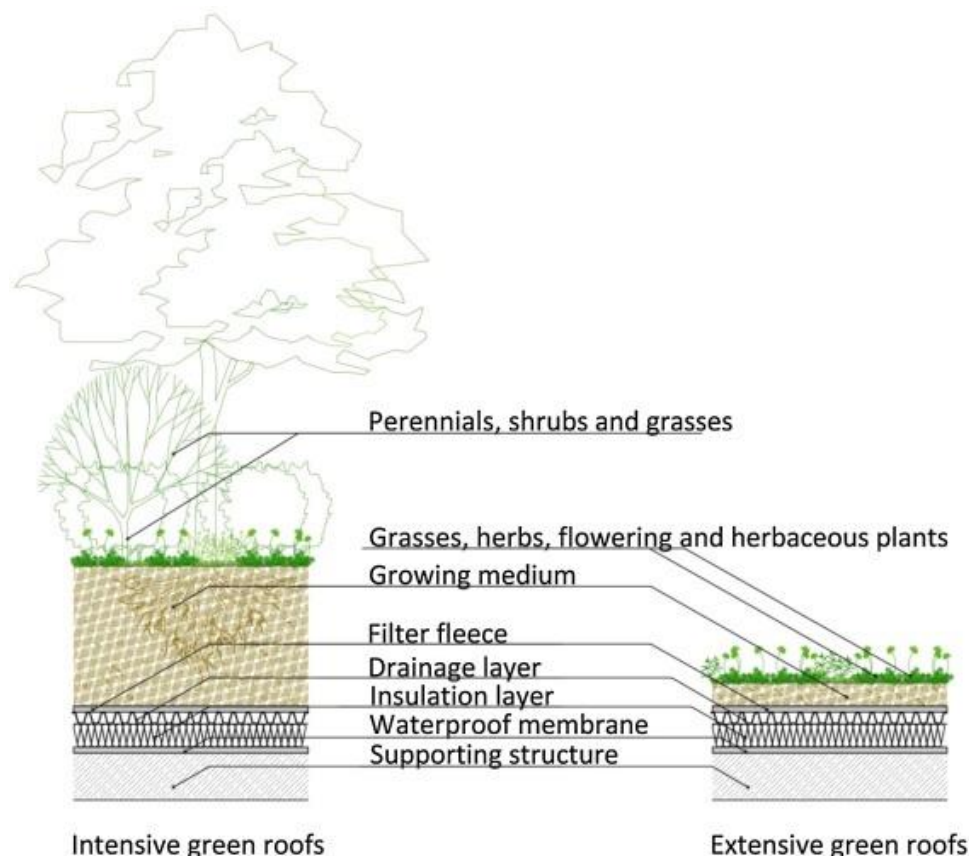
The construction layers typical for green roofs (Brudermann & Sangkakool, 2017)
